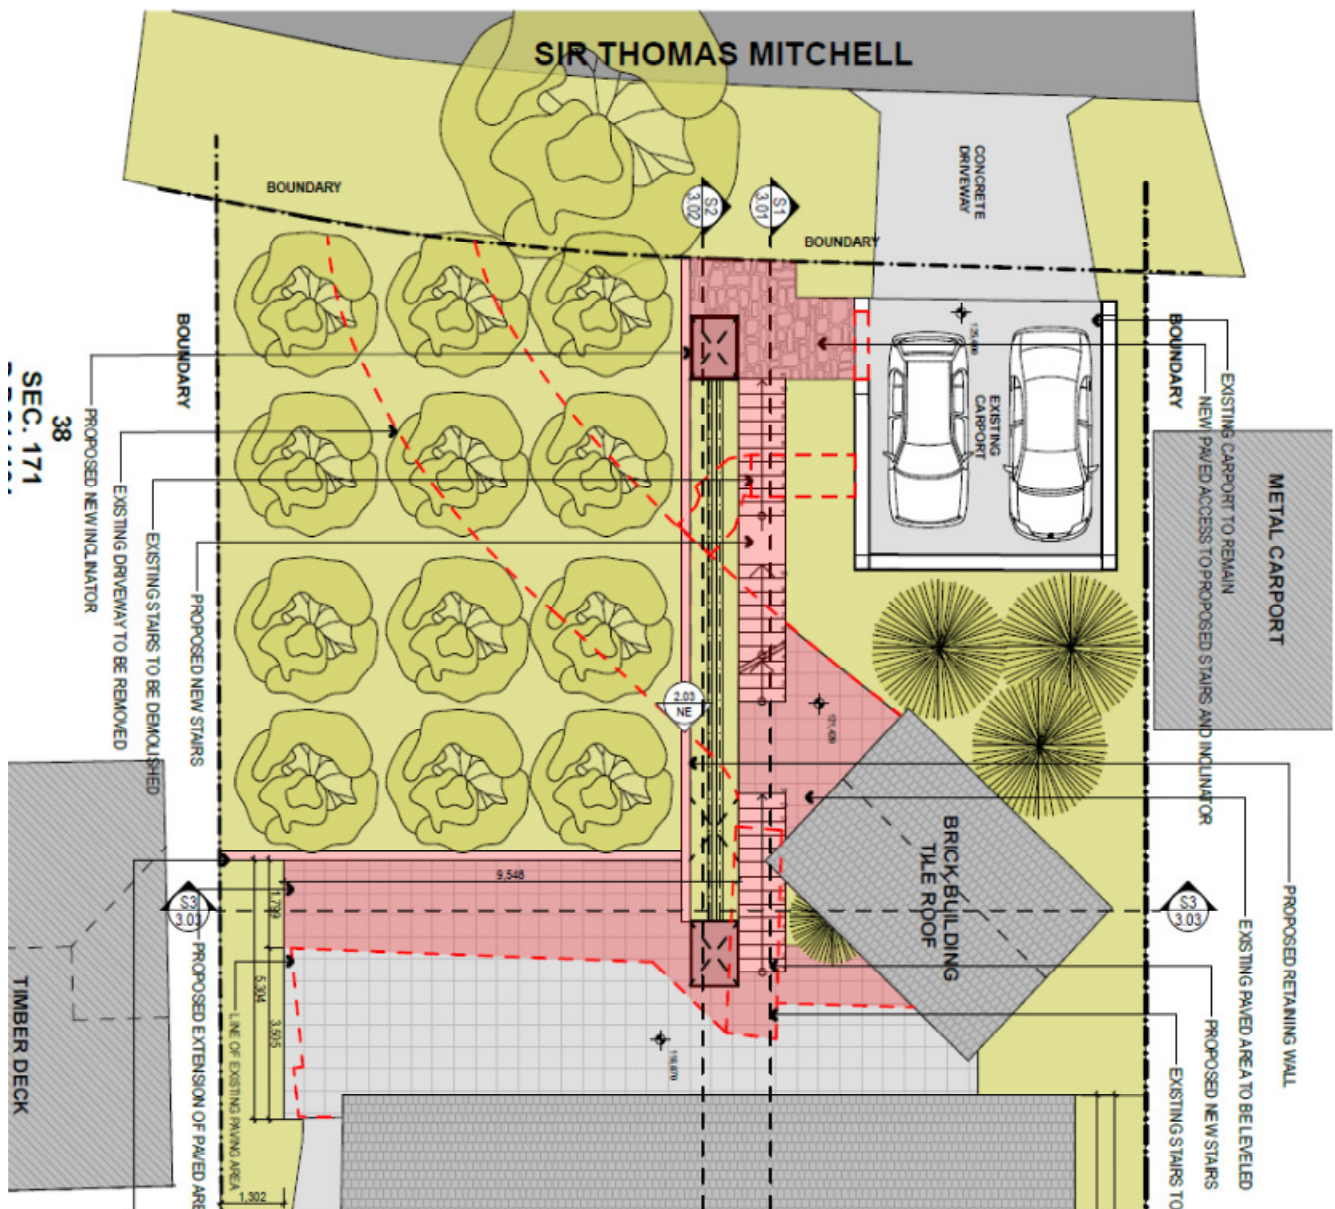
Street Level Plan extract. Trees to be retained/removed/new landscaping?
